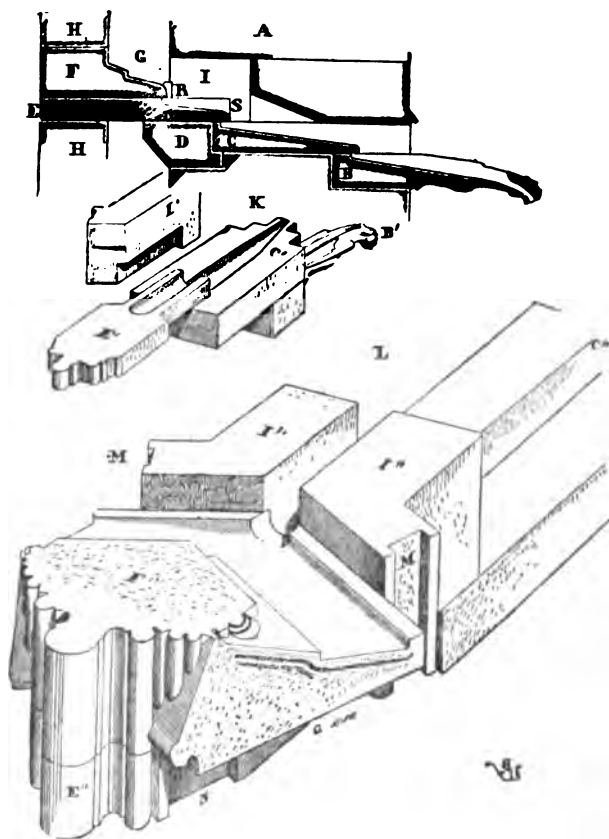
Detail of Pier and Buttress, St. Urbain, Troyes.
